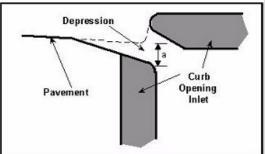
1 A curb opening inlet ("Hydraulic Design Manual" 411-412).
